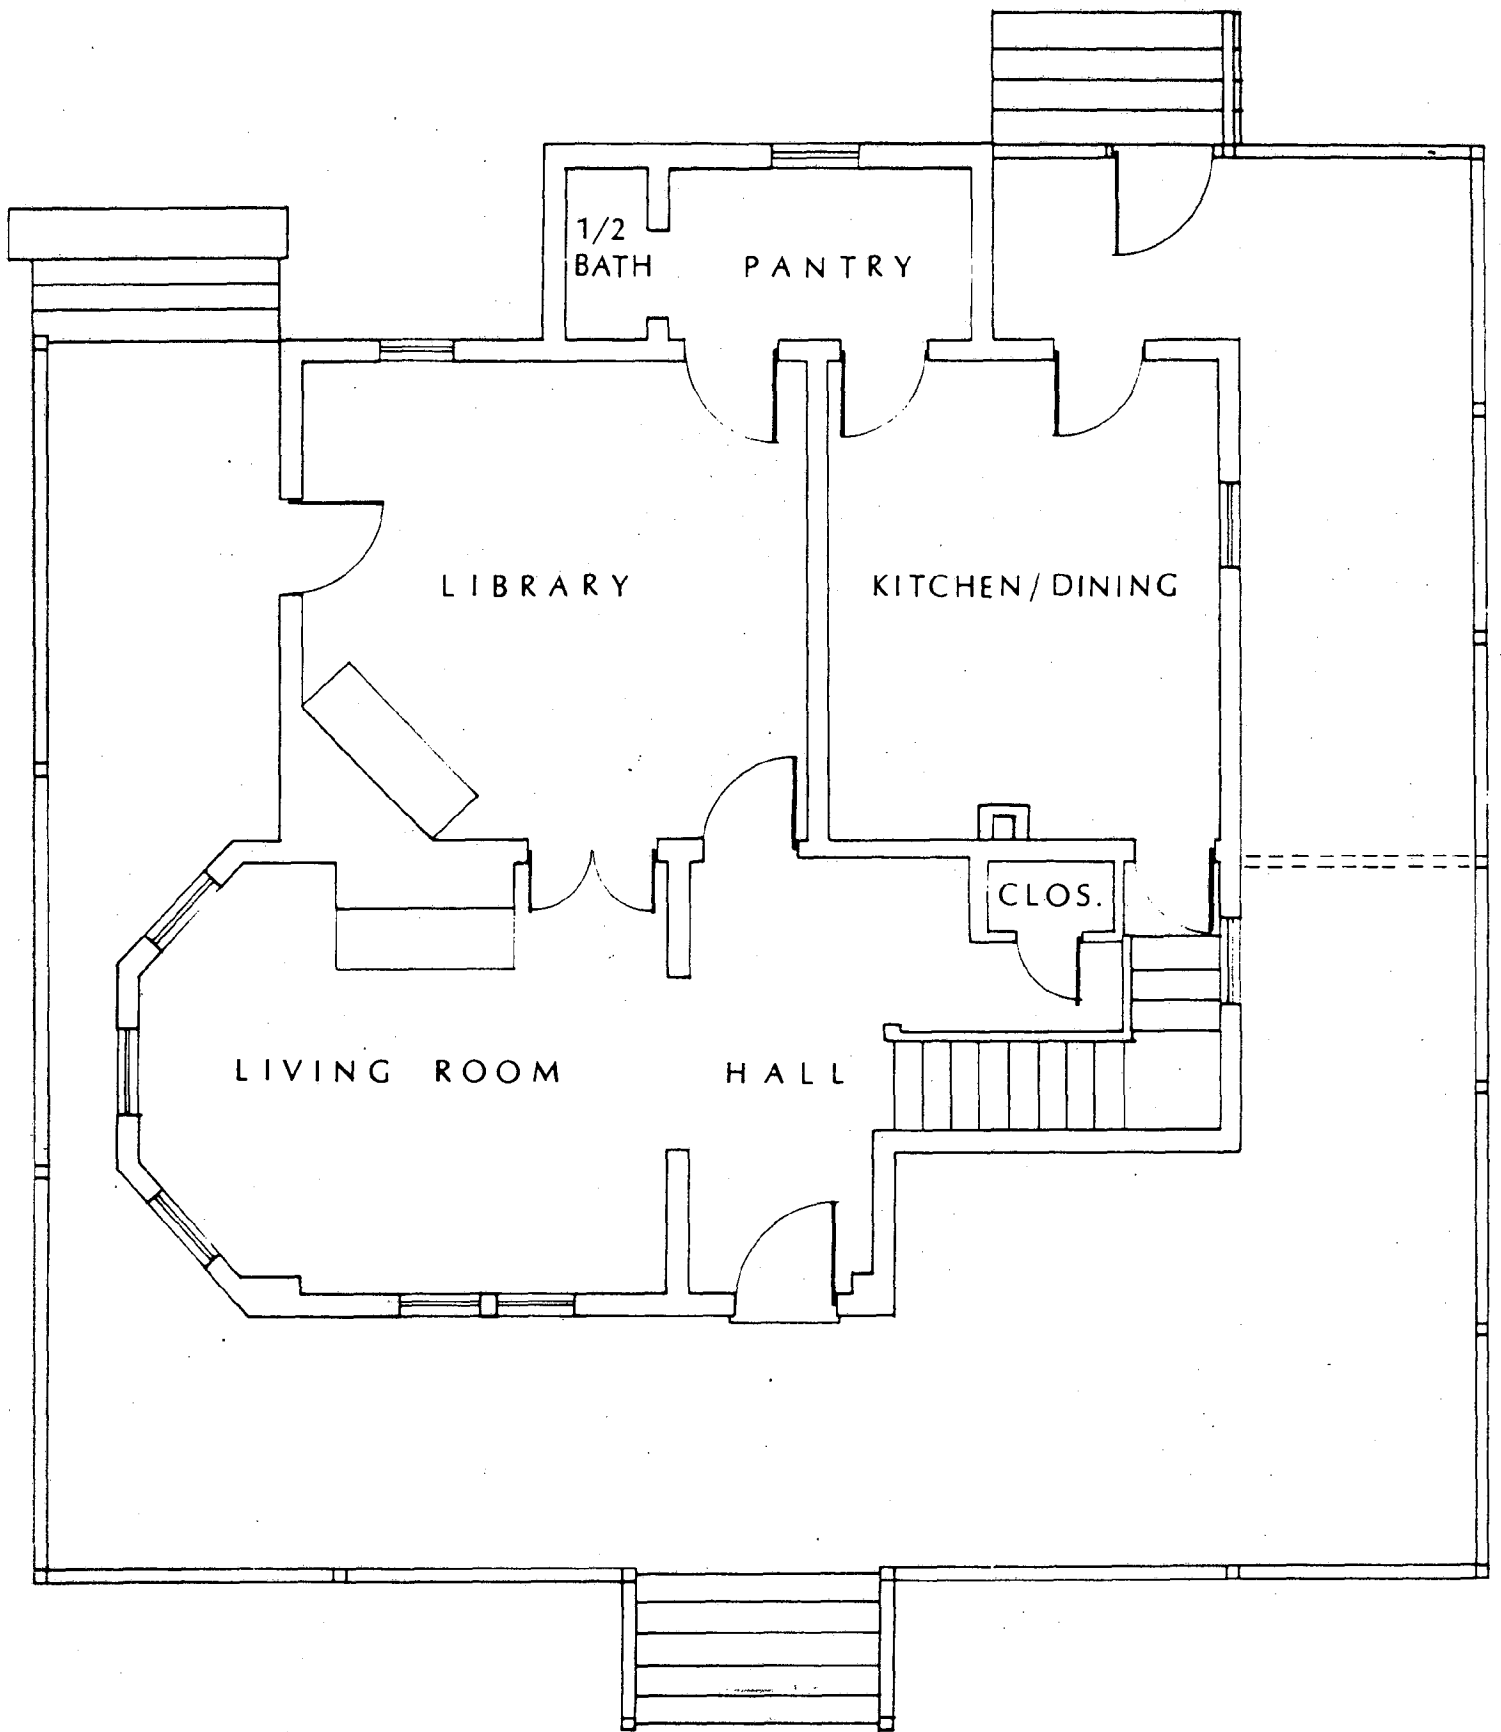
Plan of first floor and exterior wrap-around porch and stairs
